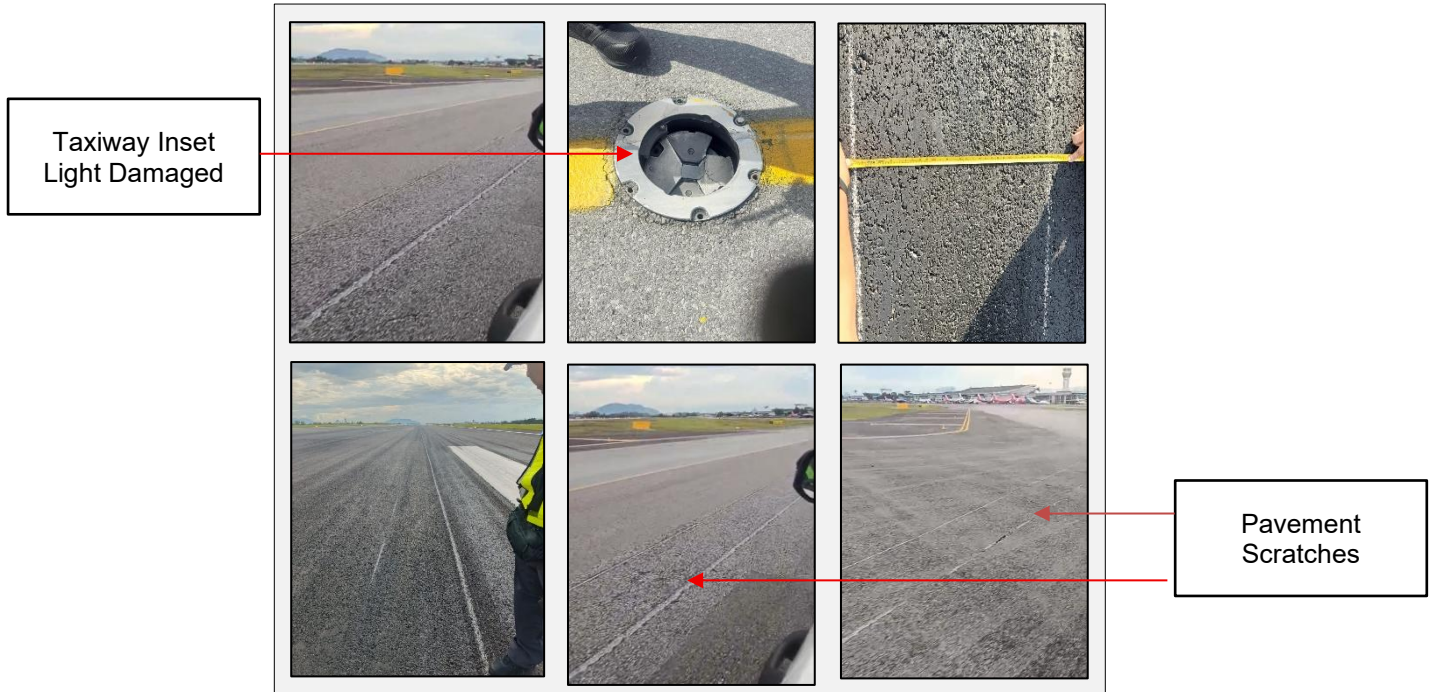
Pavement Scratches on Runway 25 and Damage to Taxiway Inset Lights at WBGG
